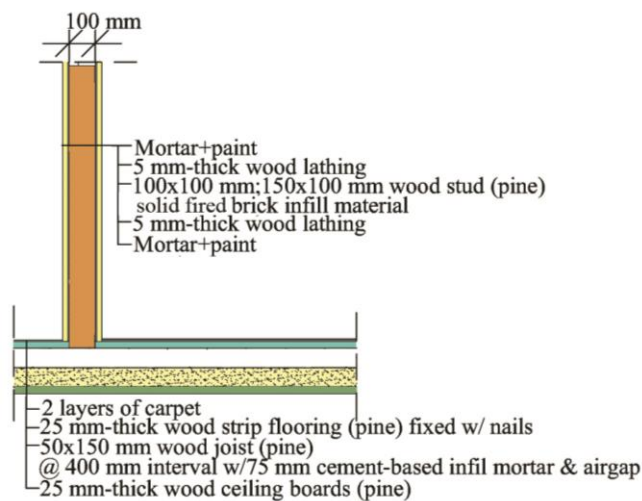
Section of Semi-Repaired-Wall 3 & Semi-Repaired-Floor 2 in 1/20 scale (Drawn by author).
